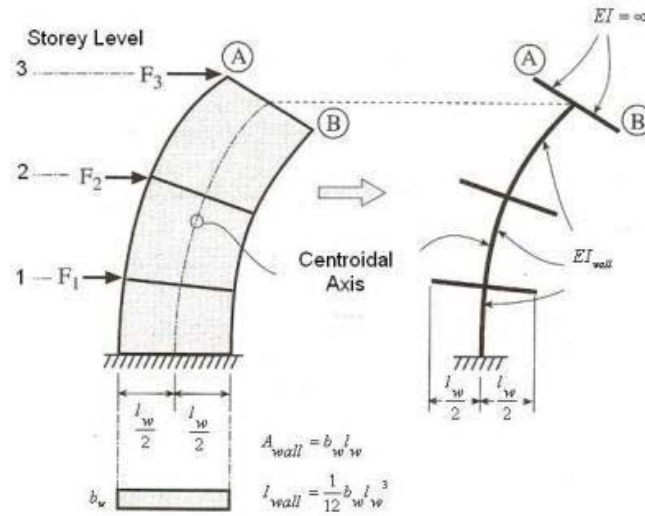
Shear Wall Model Proposed for Equivalent Beam Model [3]
